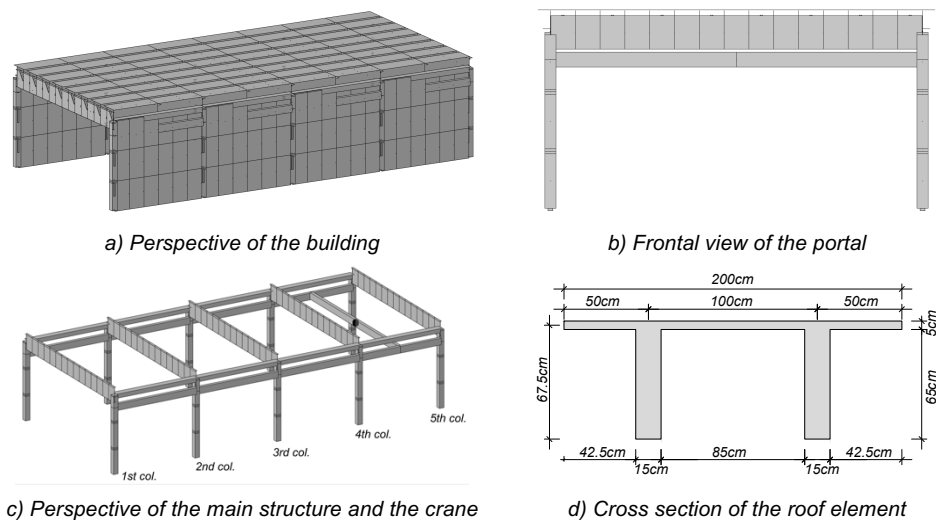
Three-dimensional model as a case study used for performing the analysis. Perspective view (above on the left); cross section (above on the right); structure without roof elements and cladding panels (below on the left); and cross section of roof elements (below on the right).
